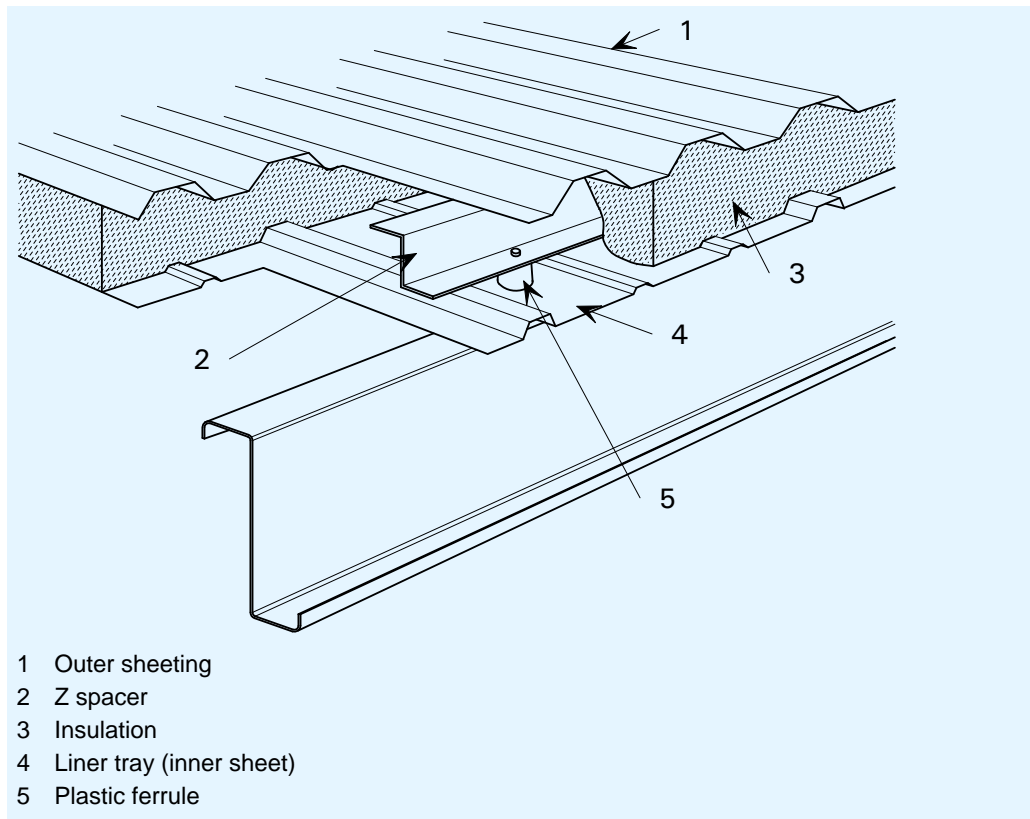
Double-skin construction using plastic ferrule and Z spacers
